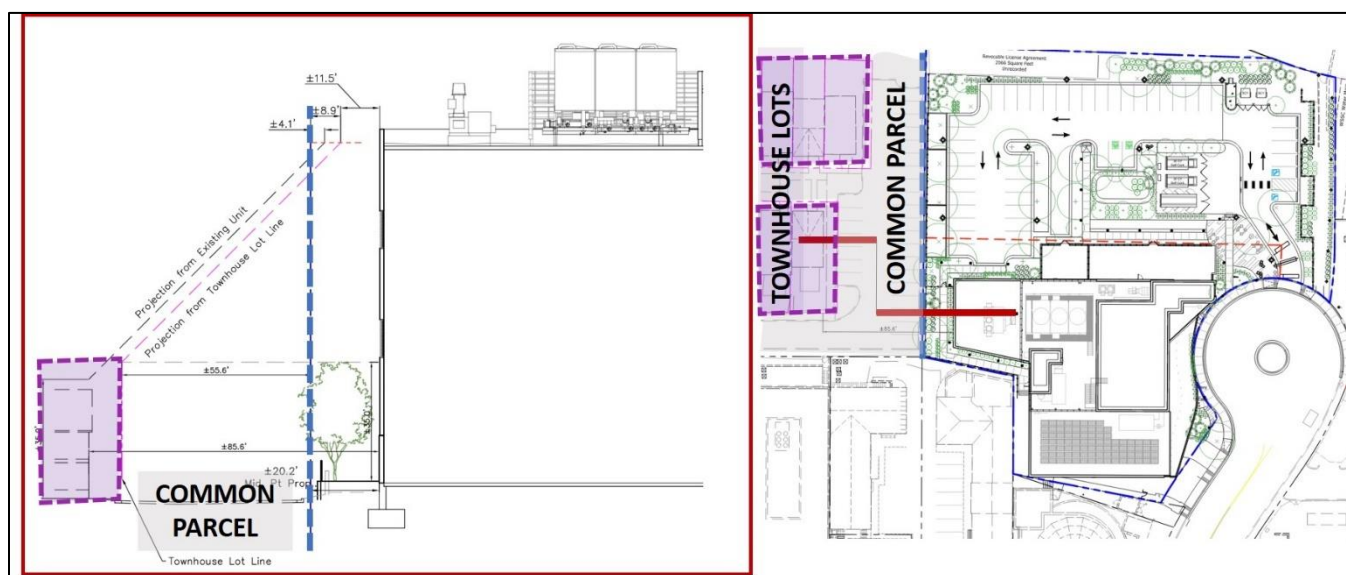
Diagram showing proposed building height with adjacent townhouse development
